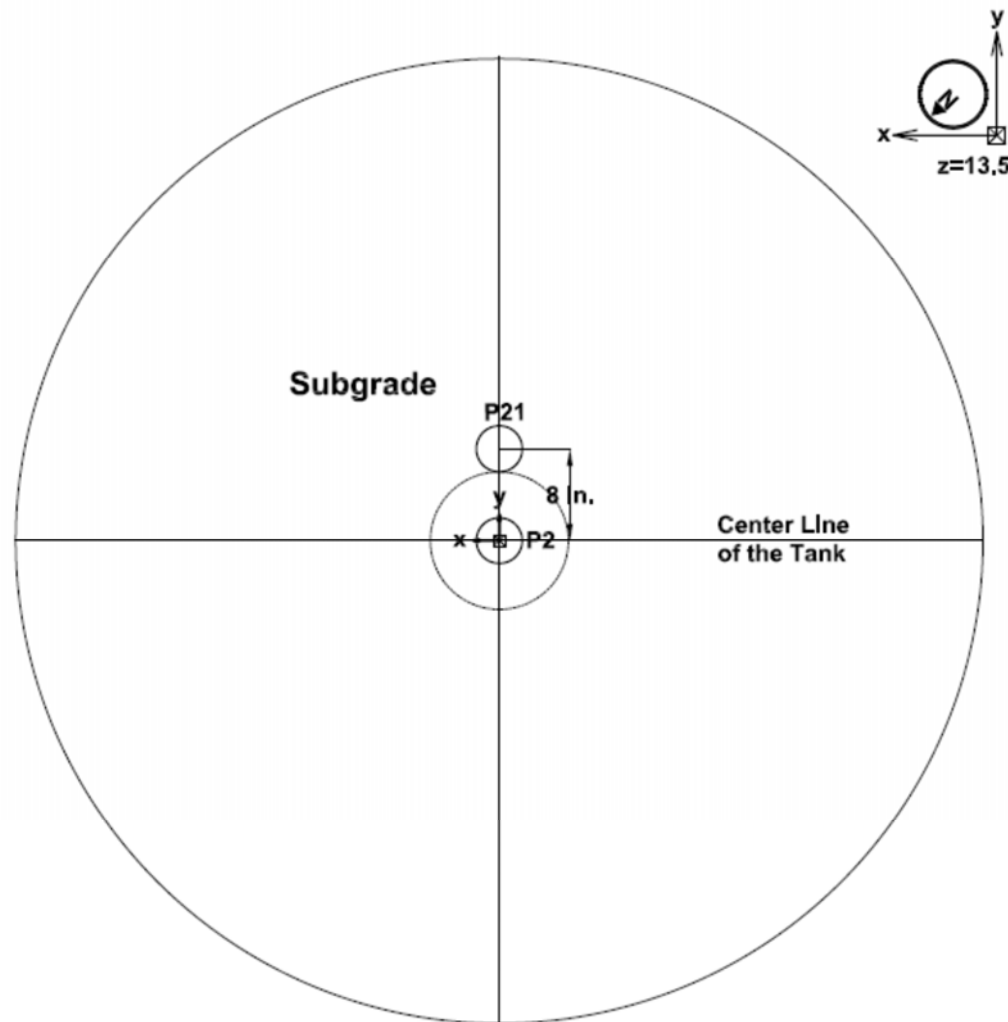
Instrumentation plan for experiment No. 2—Plan view, $Z = 13.5$ inches
